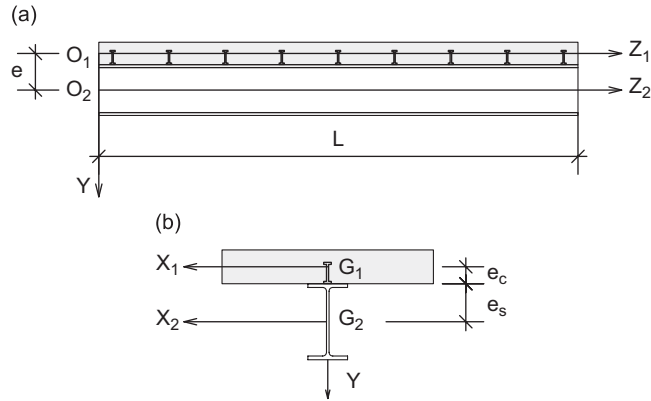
Steel–concrete composite beam: (a) longitudinal view; (b) transversal cross-section.
